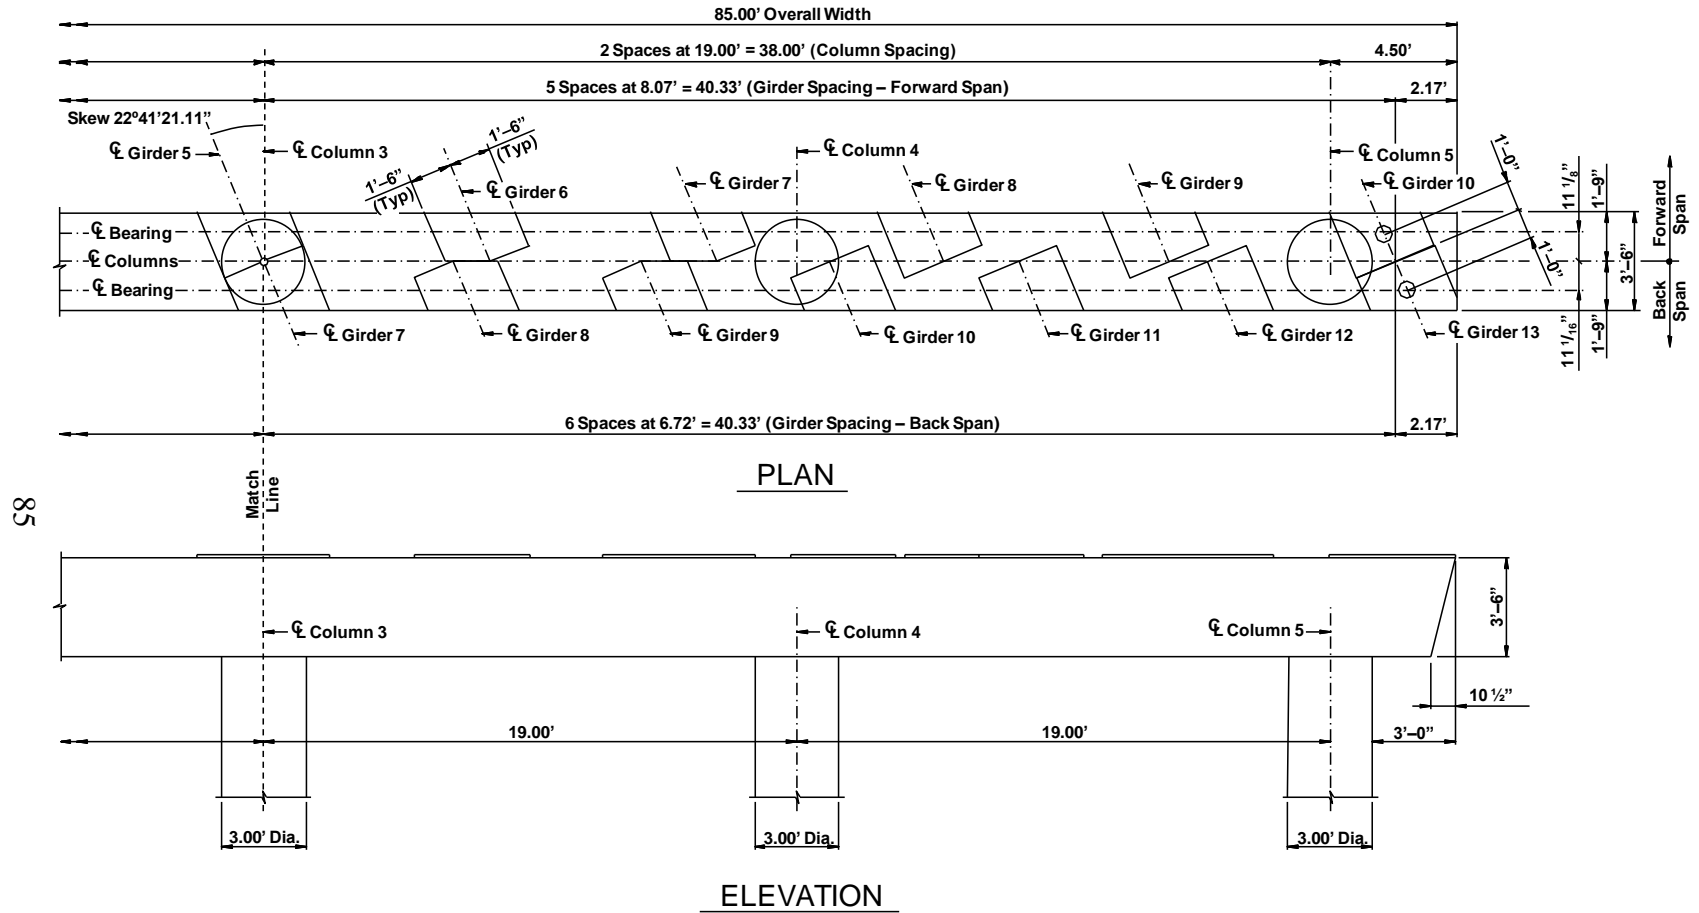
Plan and elevation views of five-column bent cap (right)
